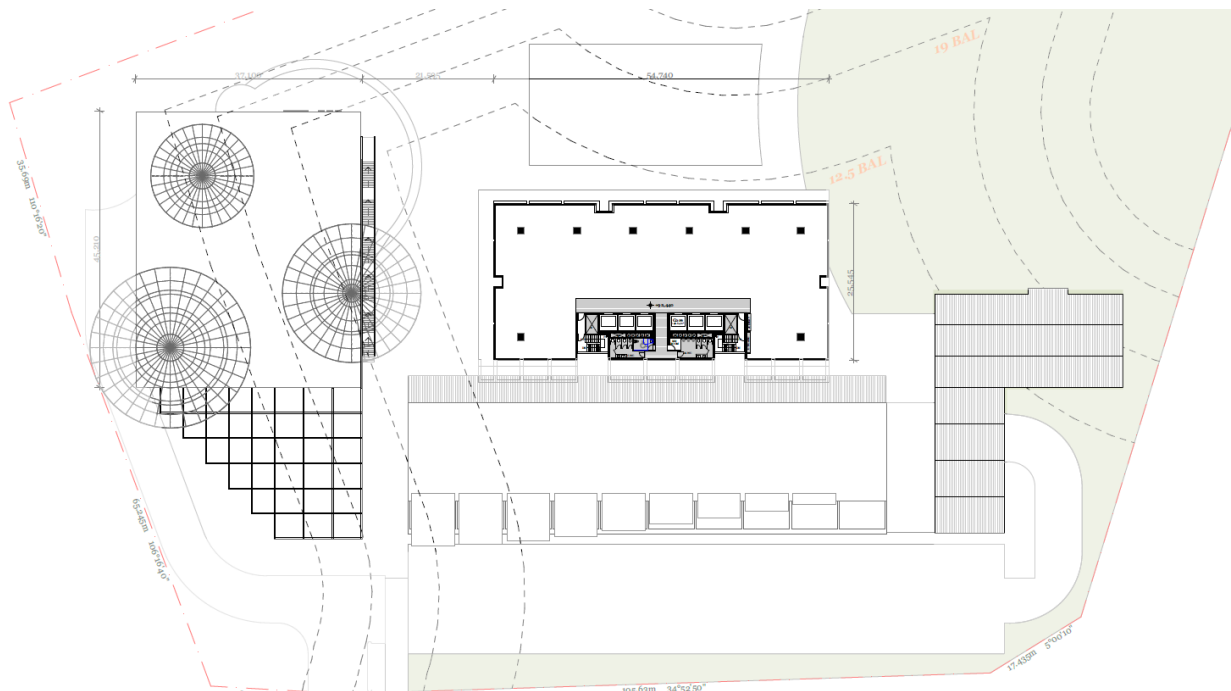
Extract of typical floor plan for levels 6- 7, 10- 11, 13- 14 and 17 (Source: DKO Architecture)
